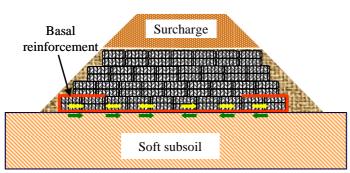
Schematic cross-section of tyre bale embankment showing the action of horizontal basal reinforcement (not to scale).
